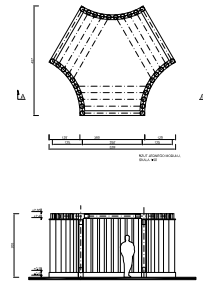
WUST Pavilion, version 1, plan view and section of single segment, 2014
